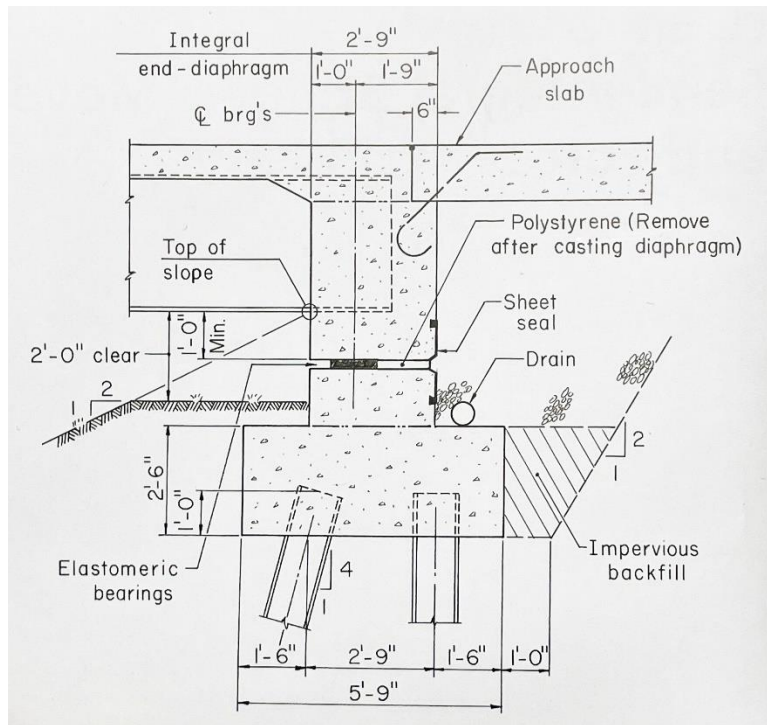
Semi-Integral Abutment Detail (Burke 2009)
